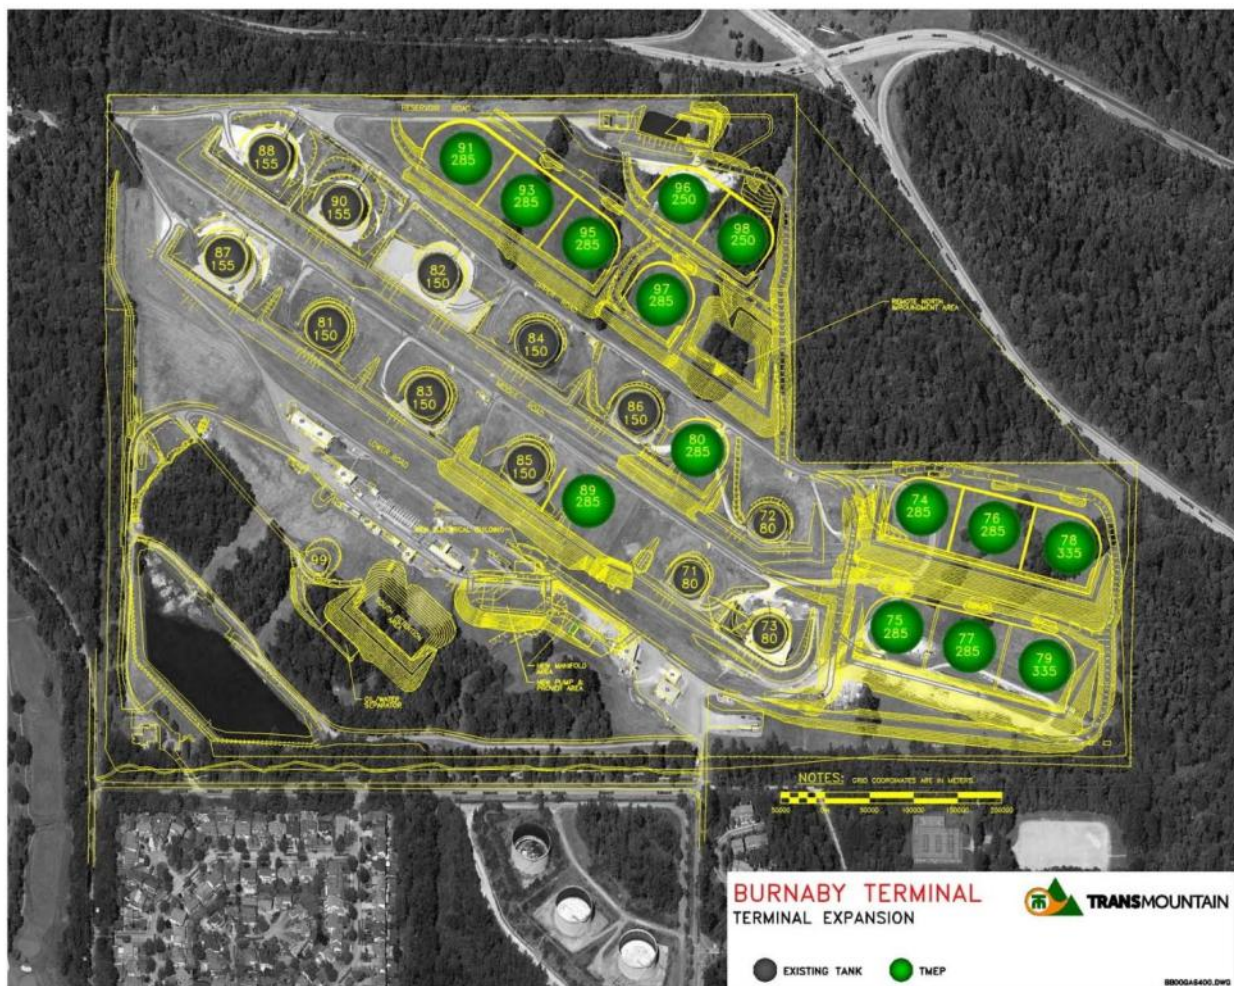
Burnaby Terminal Proposed Plot Plan
